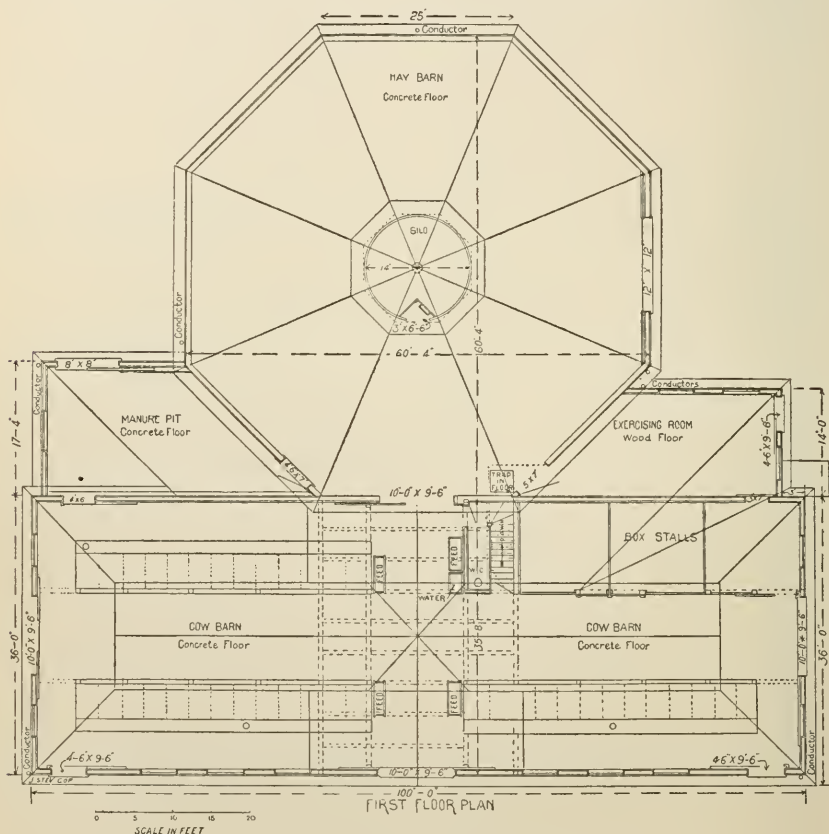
Rhode Island Station dairy barn—floor plan.
